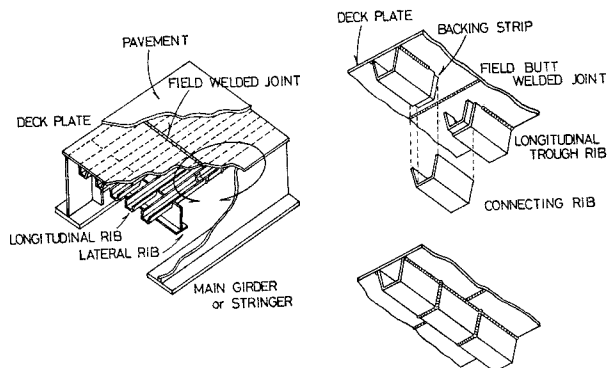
Welding procedure of field-welded trough rib joint.
